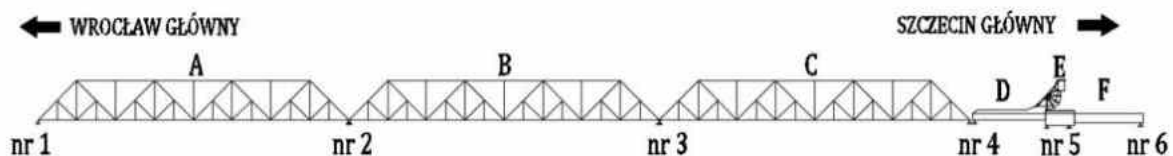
Drawing of the existing bridge with the designation of the supports (pillars and bridgeheads) and spans
